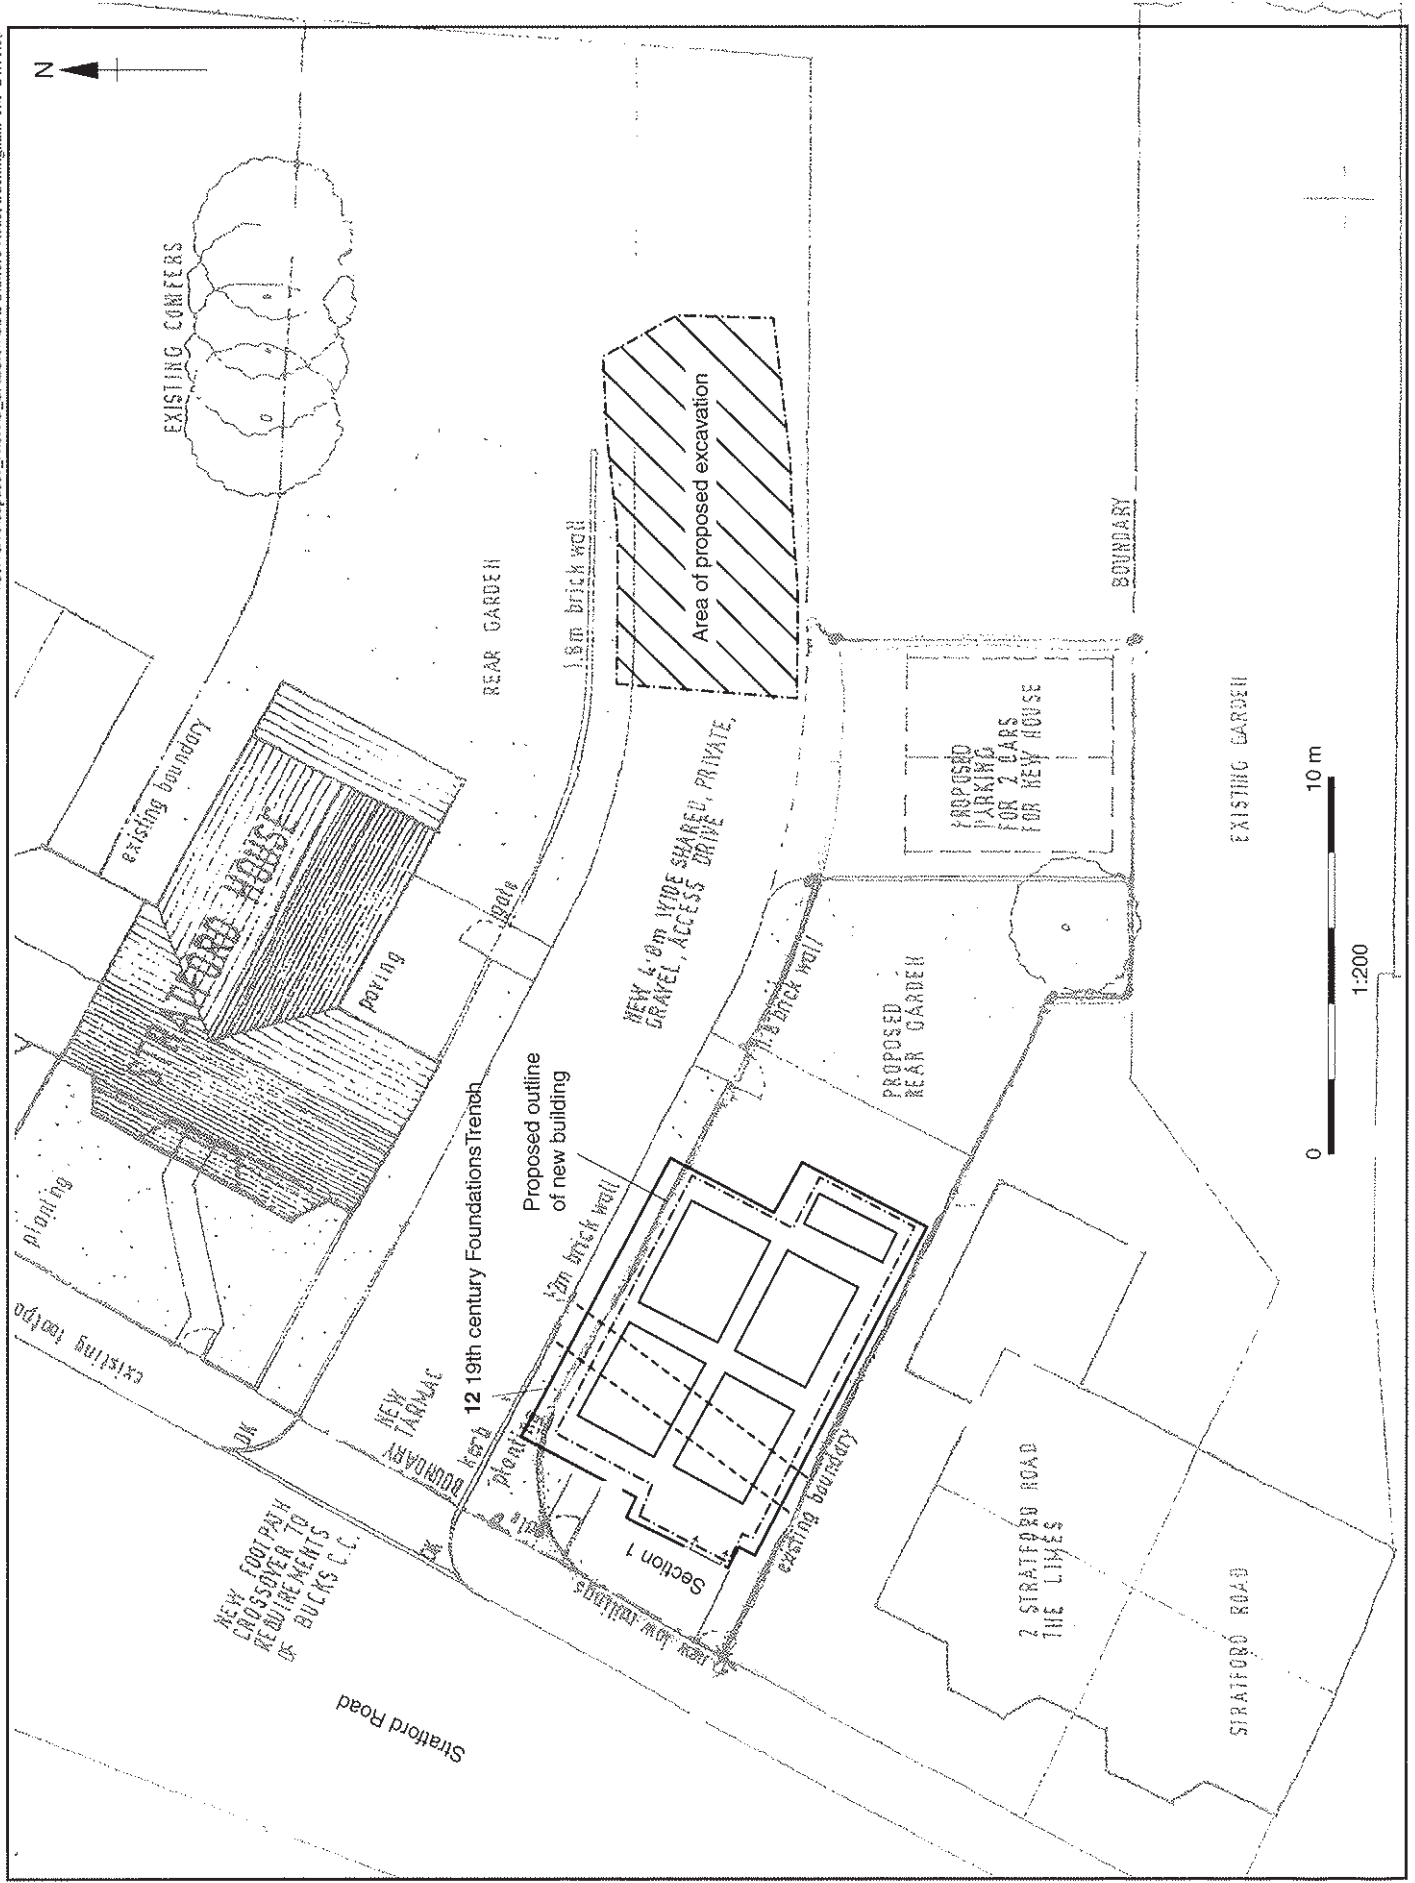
Site plan showing foundations of new building and area of excavation and section 1
